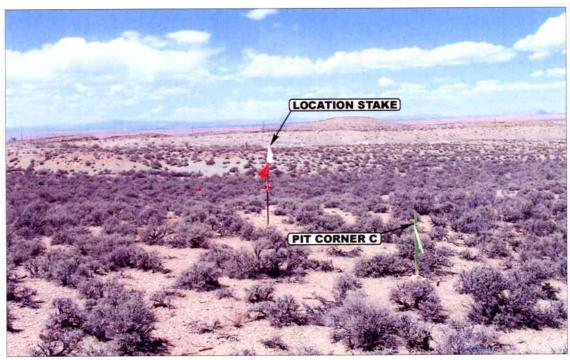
PHOTO: VIEW FROM PIT CORNER C TO LOCATION STAKE
